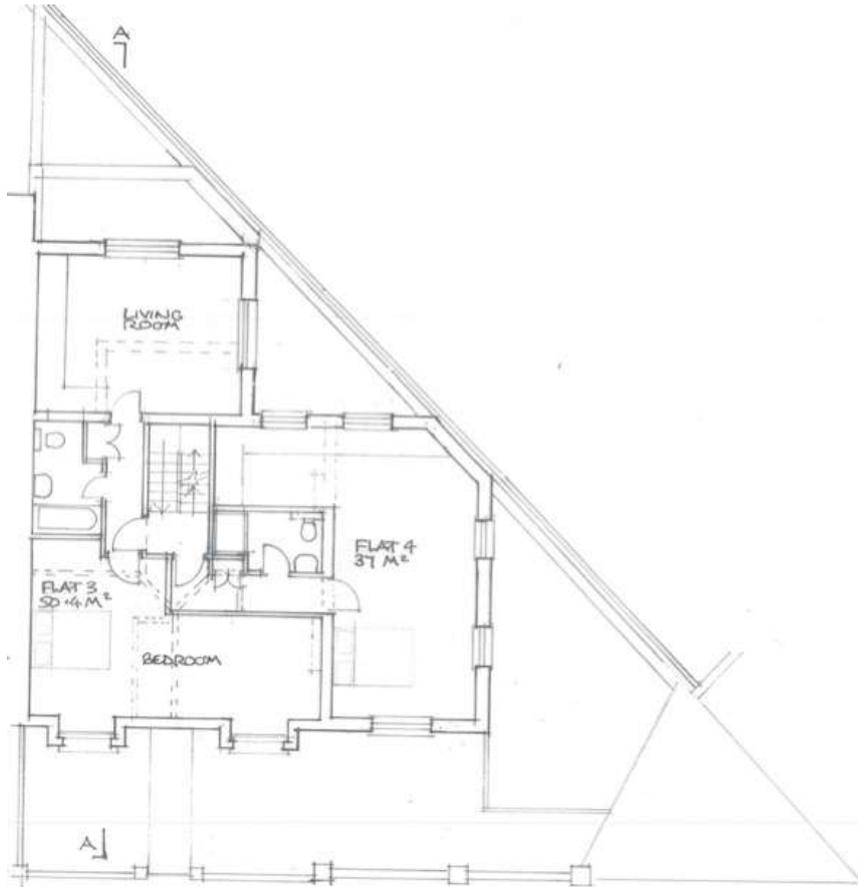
Withdrawn Proposals for 70 Berrymead Gardens – First Floor Plan
